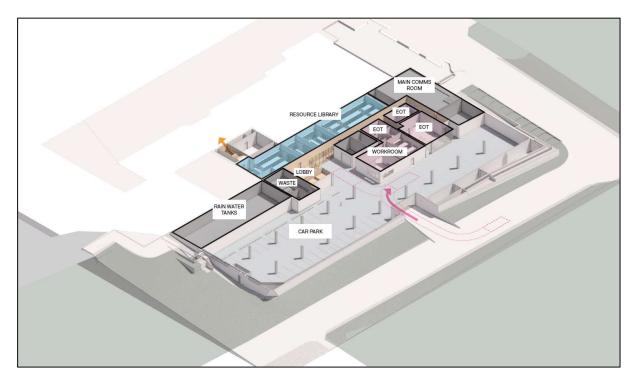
| Diagrammatic plan of basement and loading (Source: Applicant's RtS 2021)
